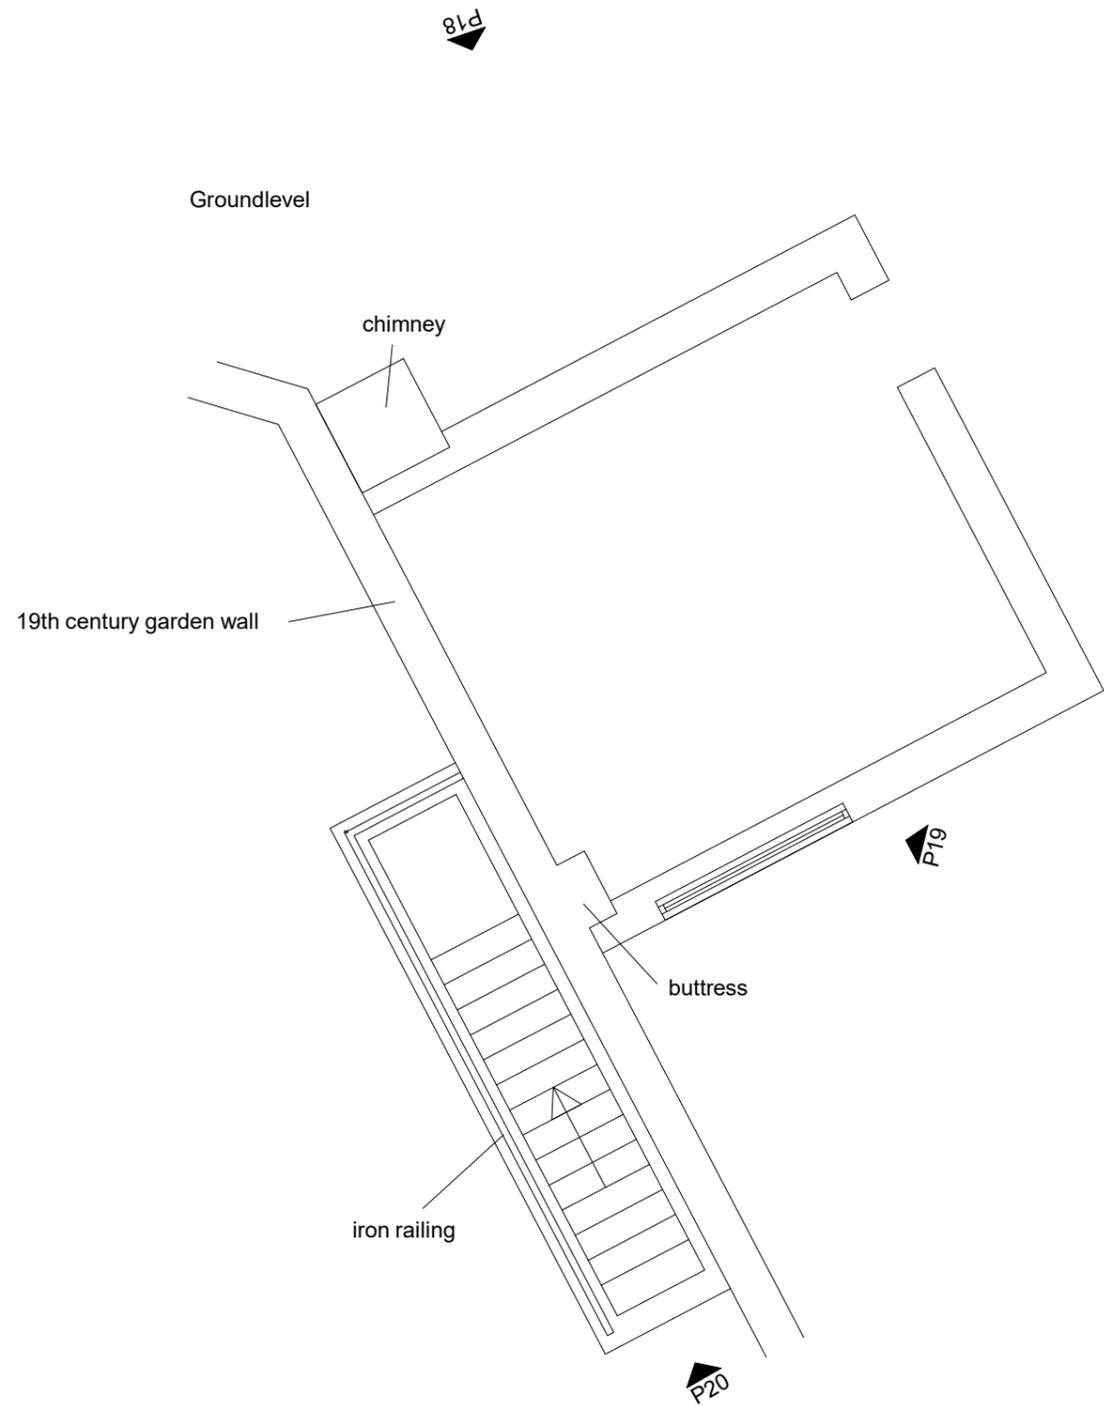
Boilerhouse floor plan. Location and direction of photographs reproduced in the text shown.
